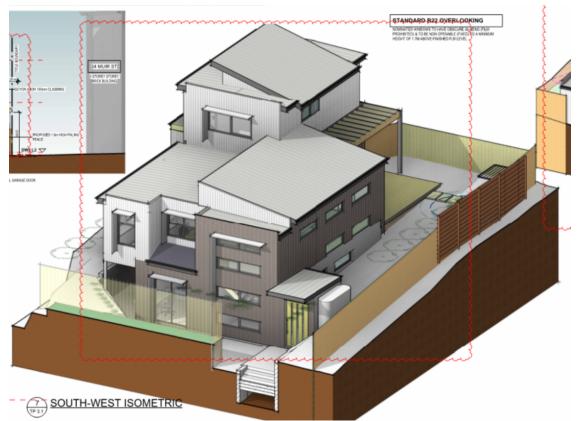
3D isometric view of the dwelling from a south-west direction
